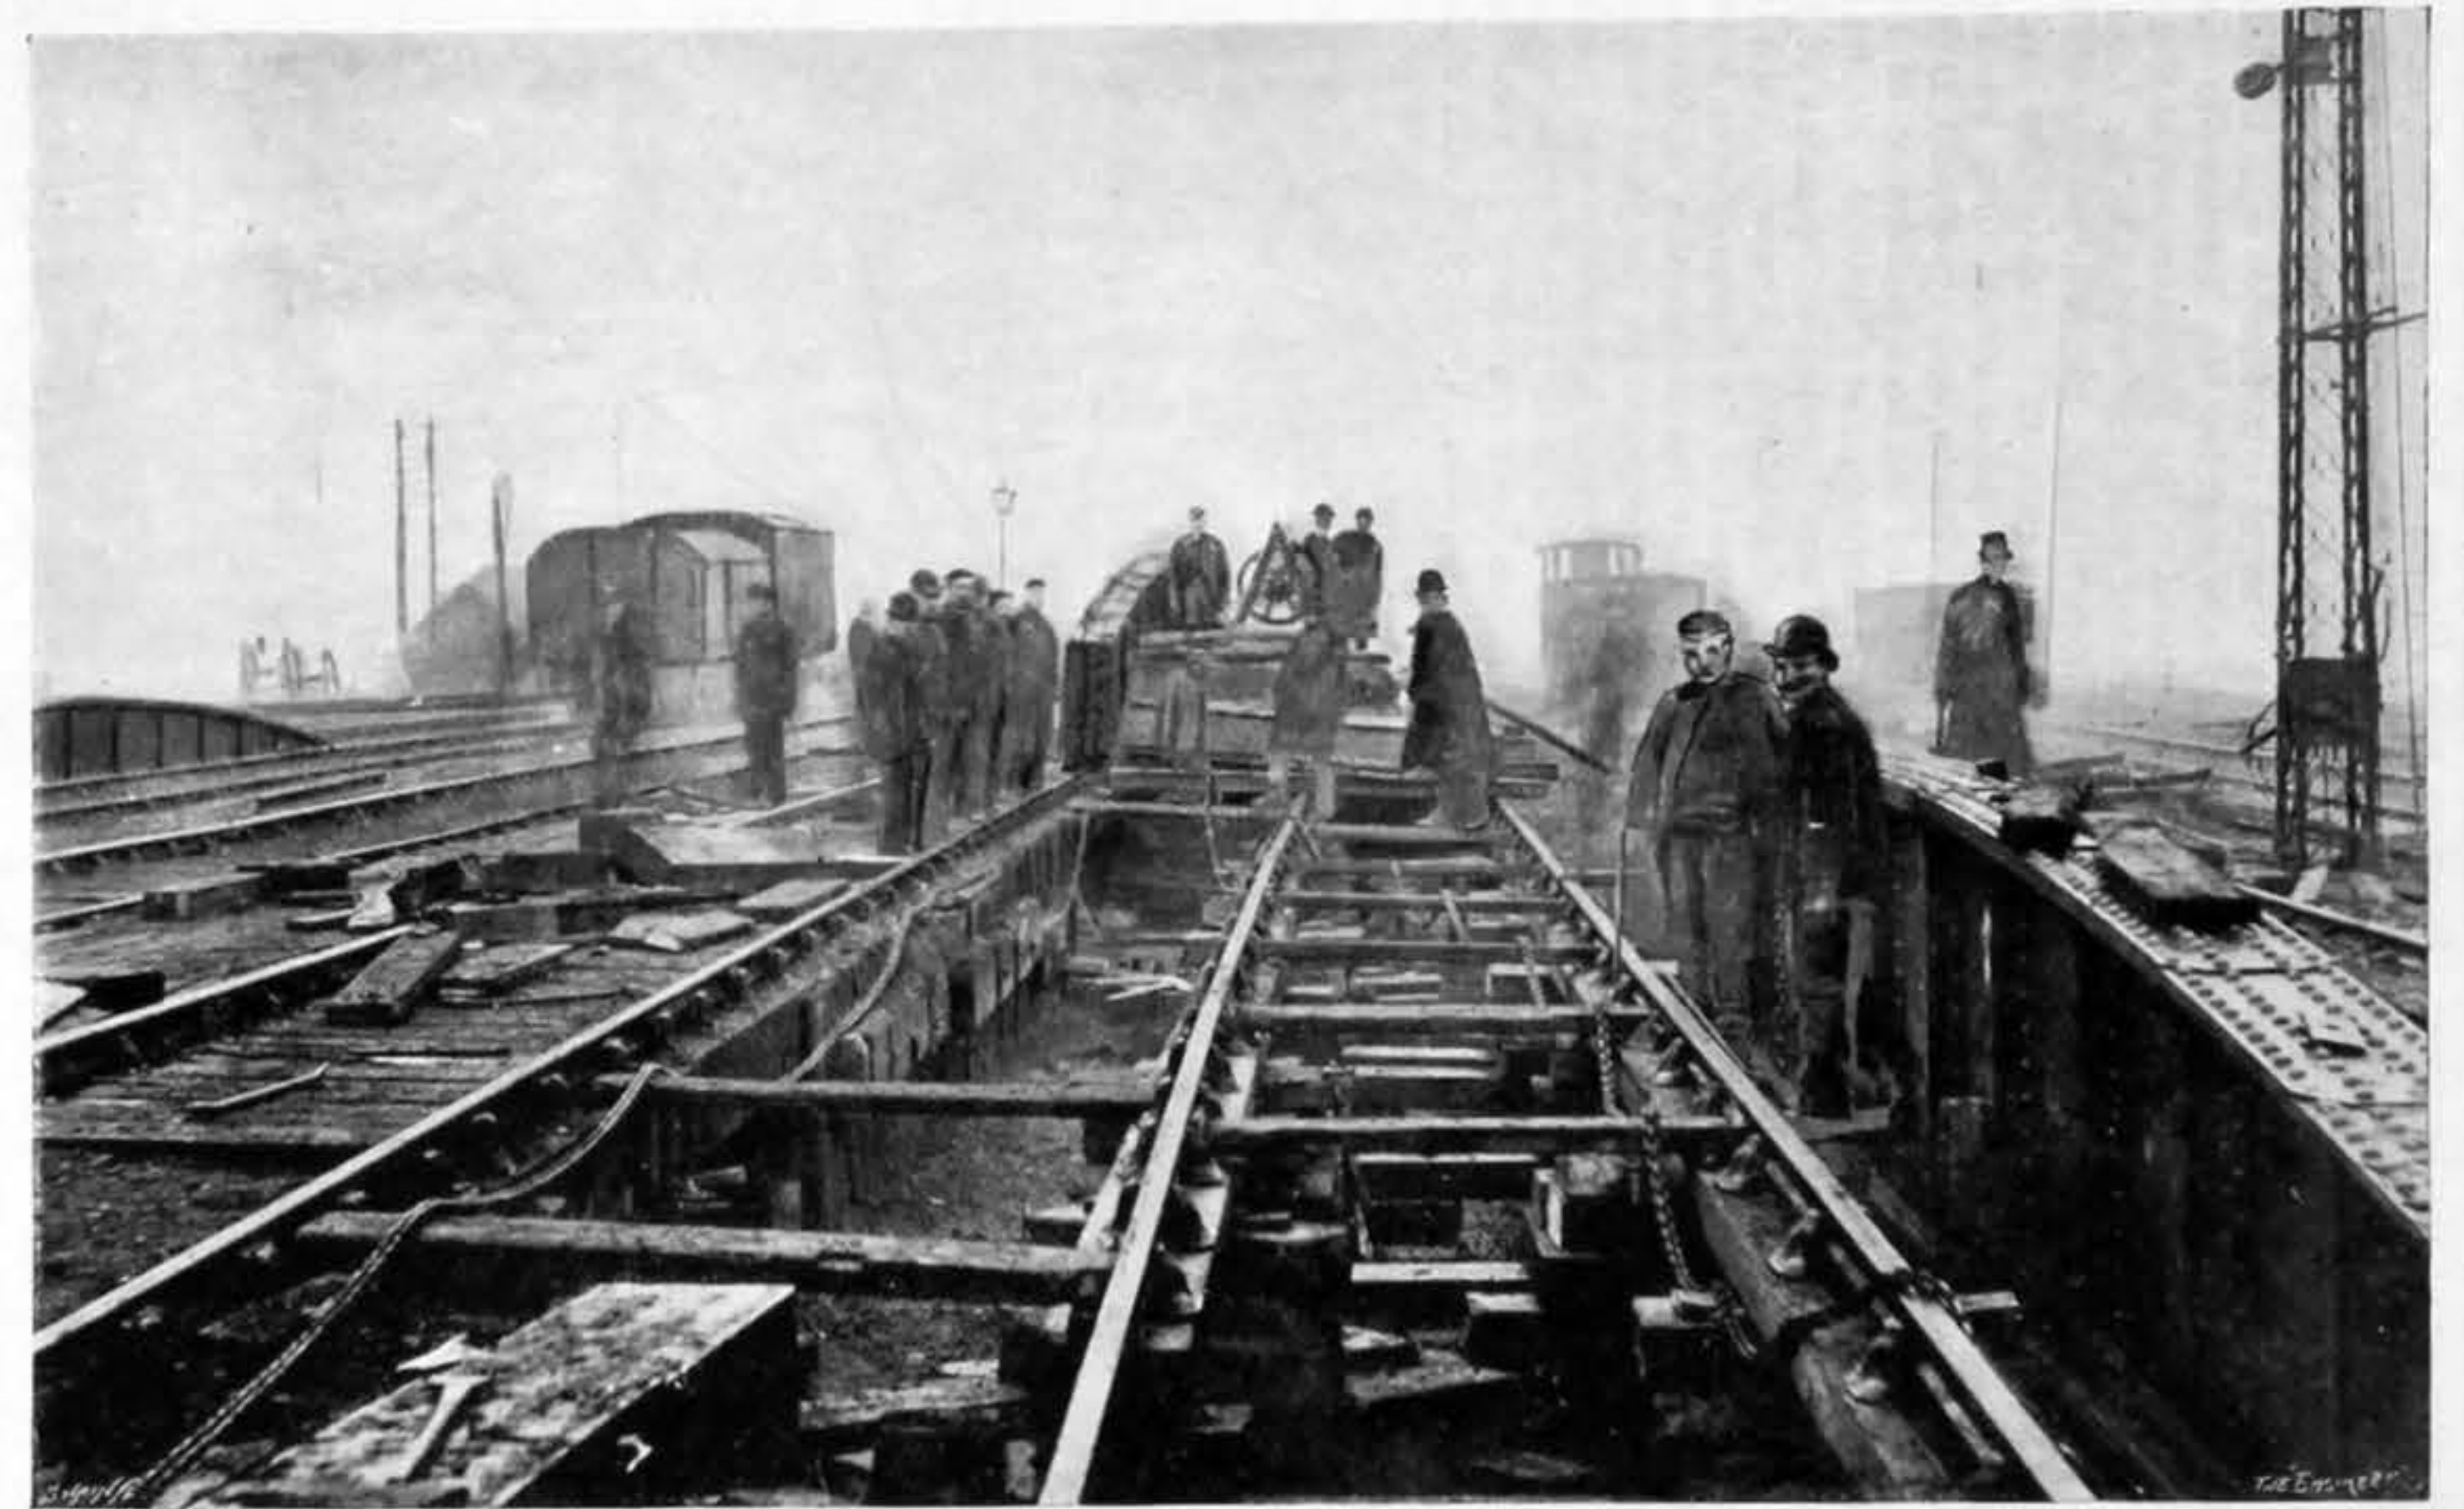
HAULING SECTION OF BRIDGE TO ITS BEARINGS—SHOWING TRENCH PREPARED TO REVERSE STEELWORK
